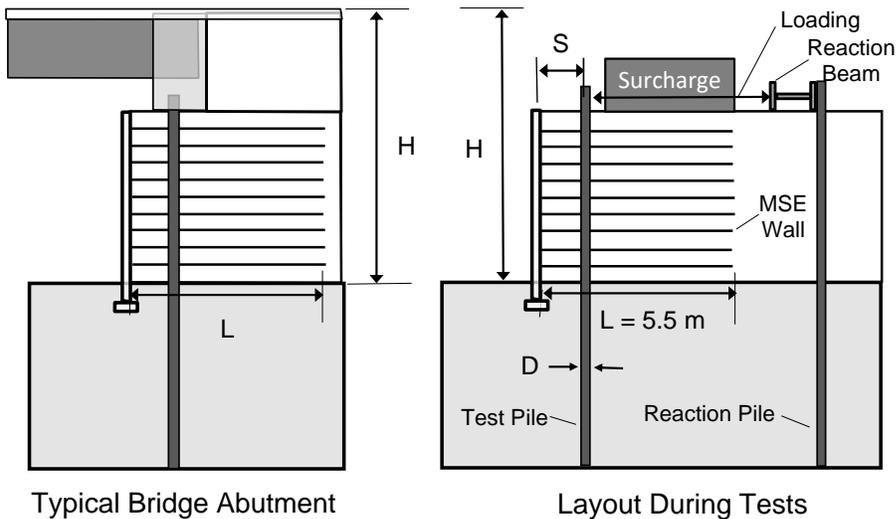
Typical layout of bridge abutment with MSE wall relative to test layout.
